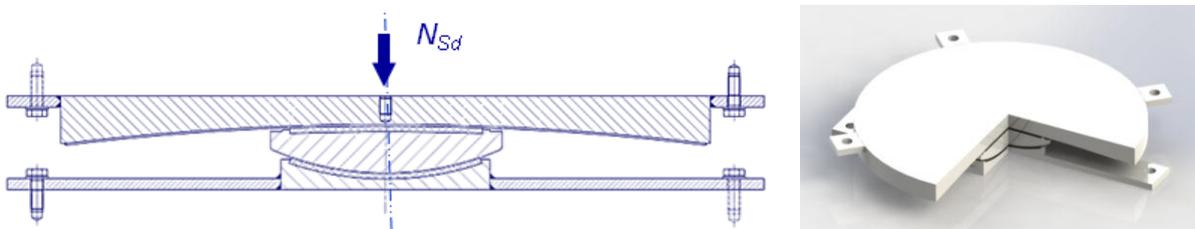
Cross-section and cut-out view of a typical pendulum isolator bearing.
